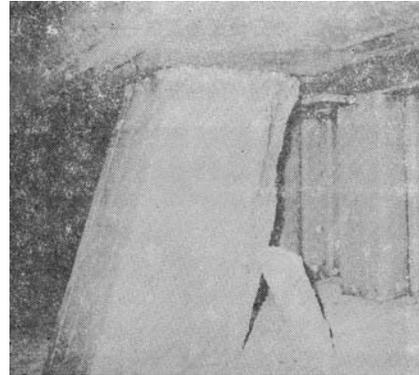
Earthquake damage to inclined bearing pile leaning against the sheet pile wall.
